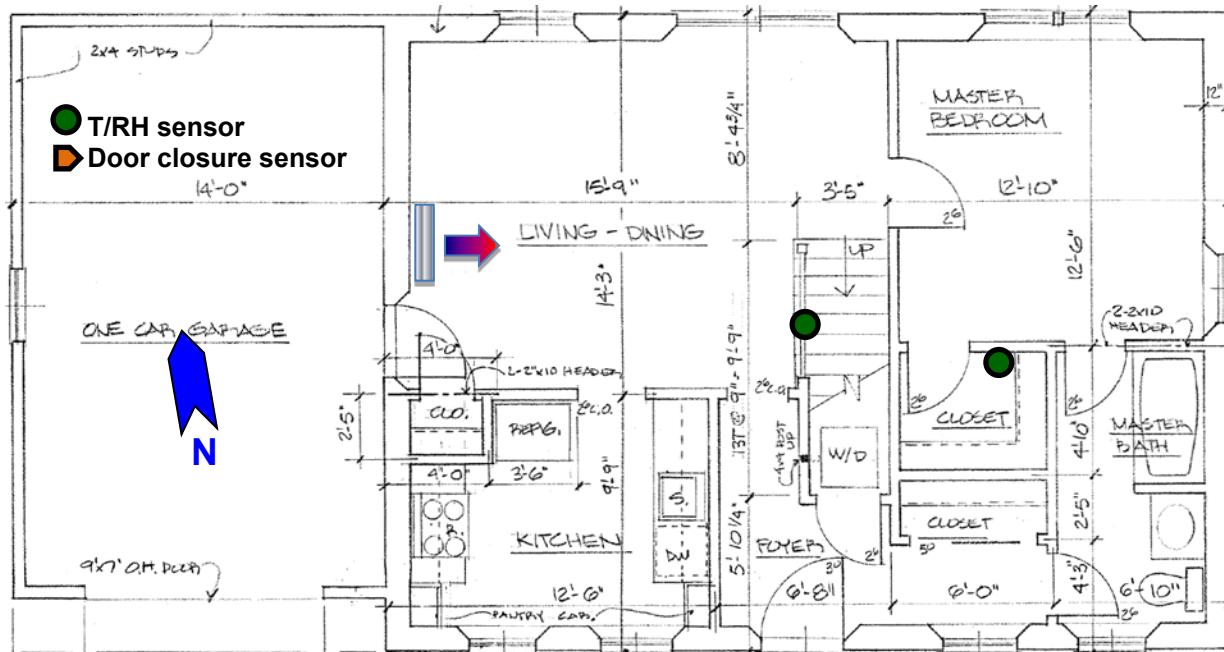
Easthampton Lot 17 first-floor plan, MSHP locations, monitoring locations
